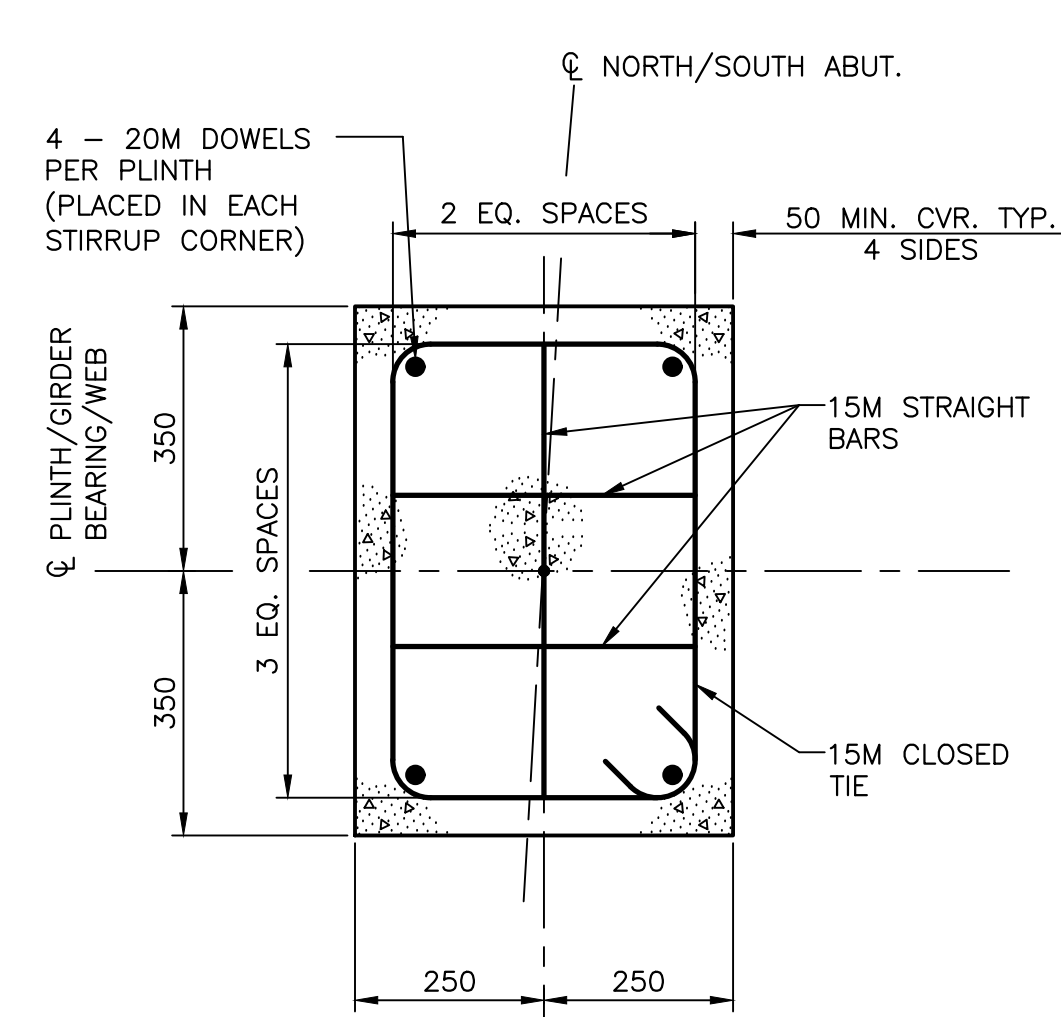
DETAIL - BEARING LAYOUT PLAN AND ELEVATIONS
